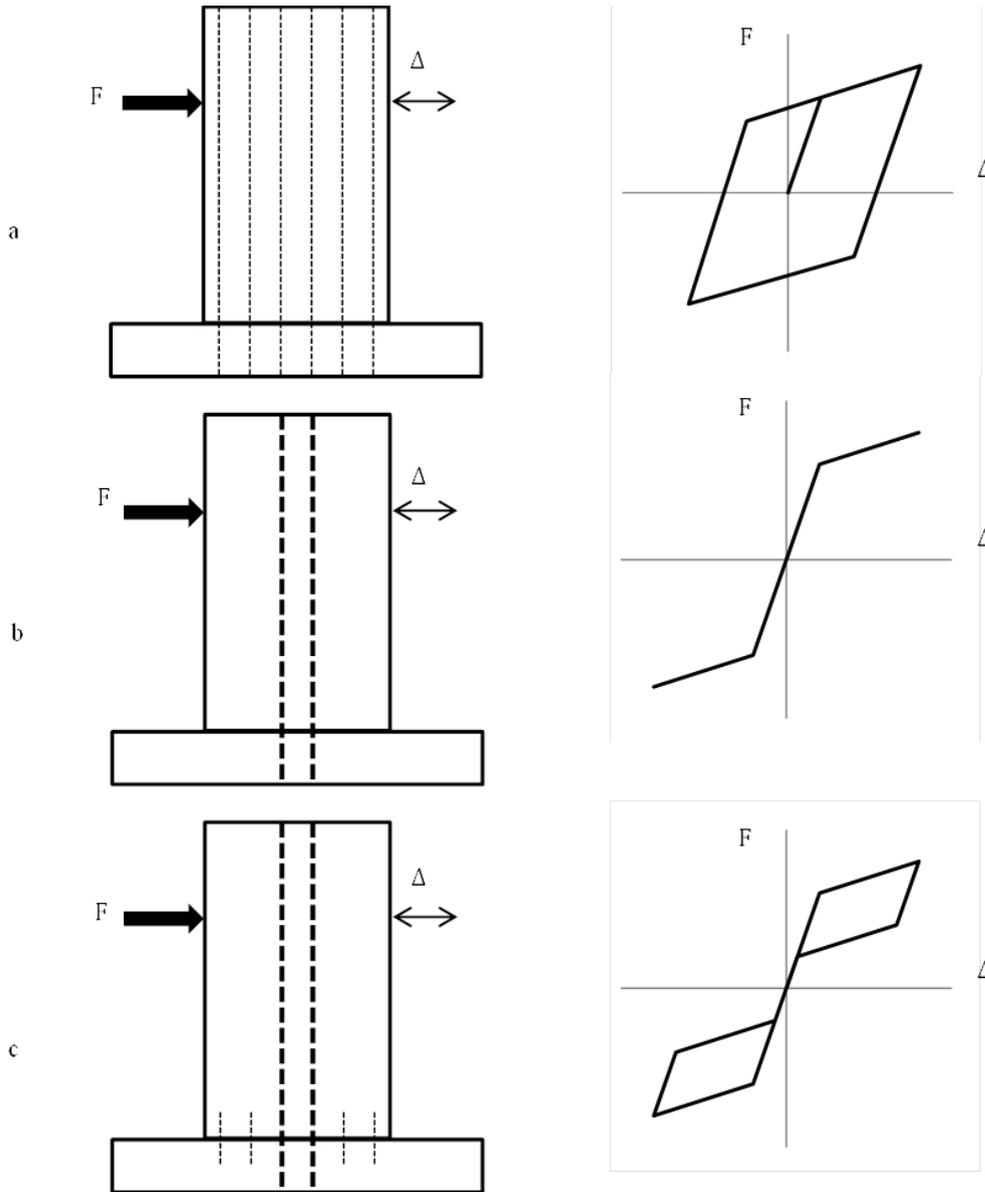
(a) conventional cast-in-place wall; (b) unbonded post-tensioned wall; (c) unbonded post-tensioned hybrid wall.
